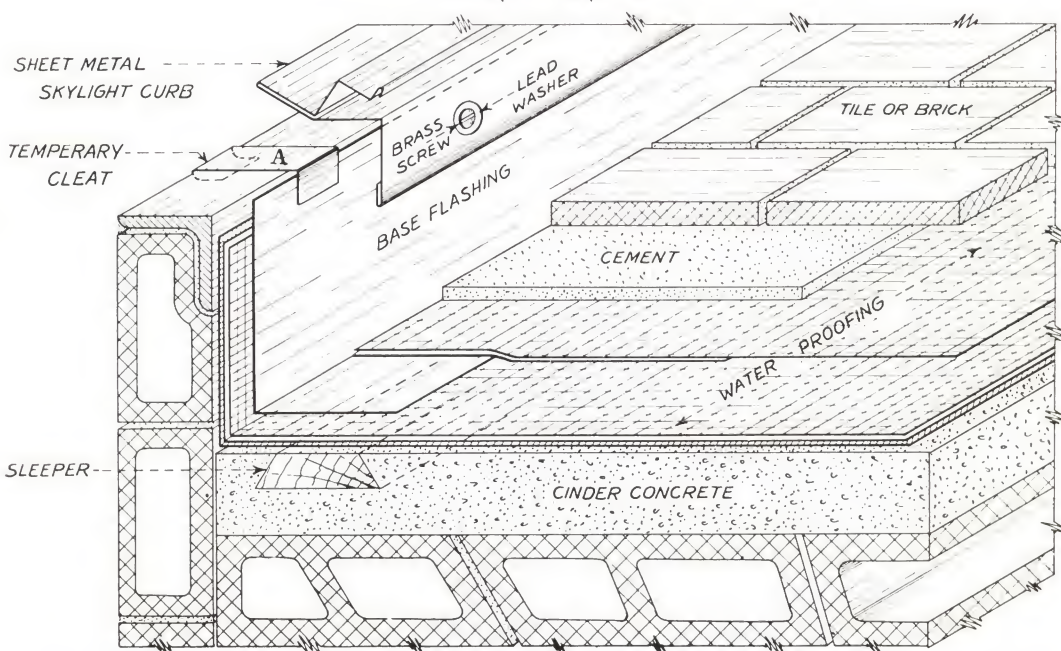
FLASHING SKYLIGHT FRAME IN CONNECTION WITH TILE OR BRICK ROOFING SCALE-1 1/2"=1'-0"
